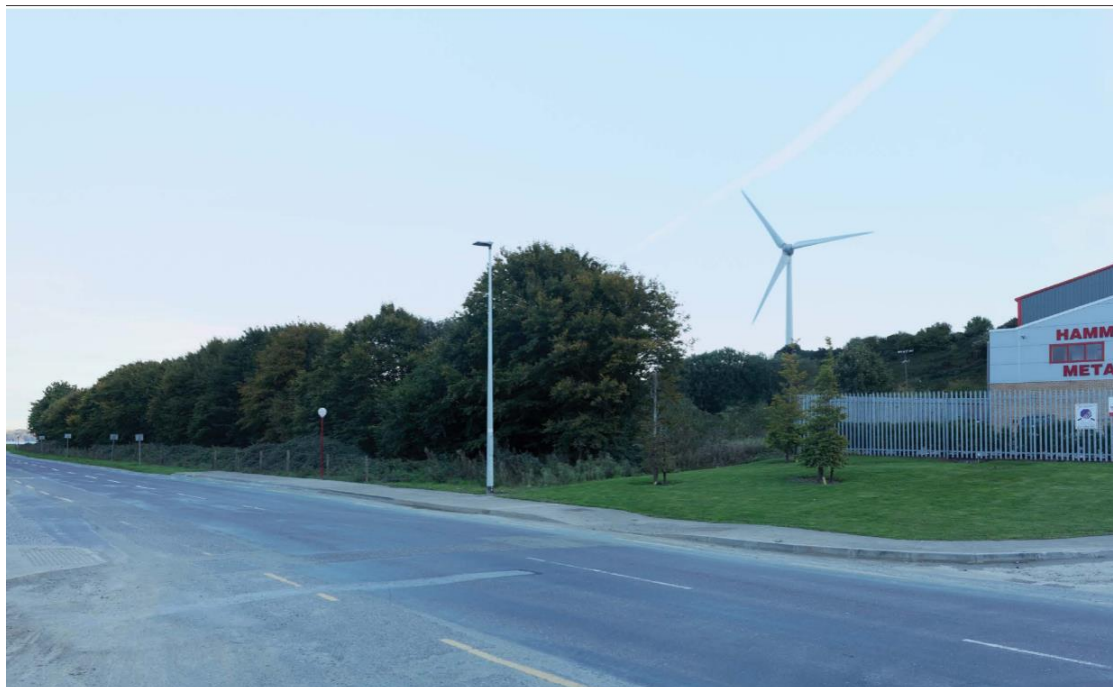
Proposed Development Site from the L2545 adjacent to Hammond Lane Metal Recycling
